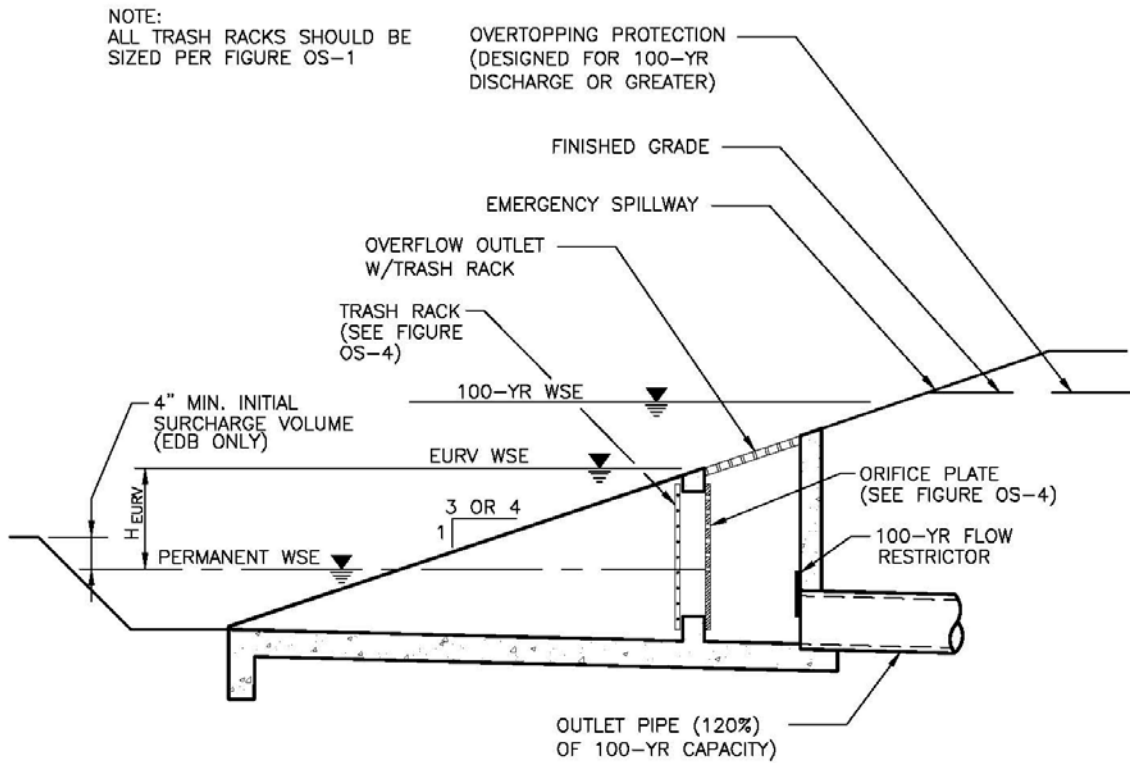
Typical Outlet Structure for Full Spectrum Detention
